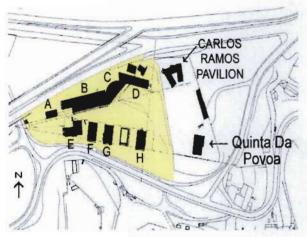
Site plan, (El Cropius, pg 160)
